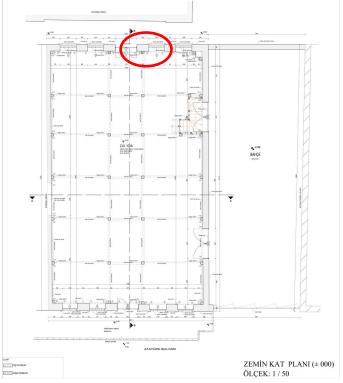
Ground Floor Plan of the Soap Factory (Drawn by Gedik Architectural Office)
